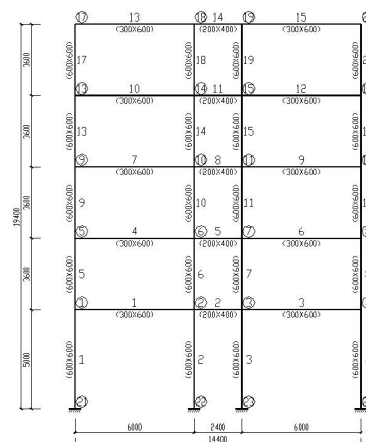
Elevation diagram of reinforced concrete frame structure example
